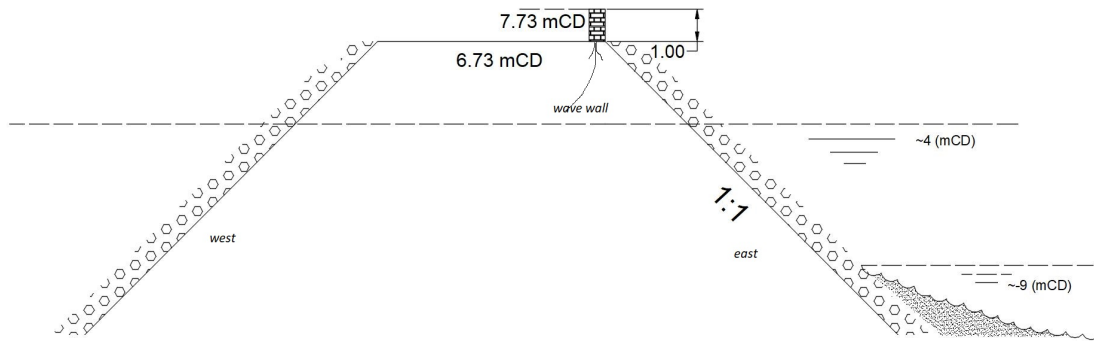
Cross section sketch of barrier, with present wave wall on crest.
